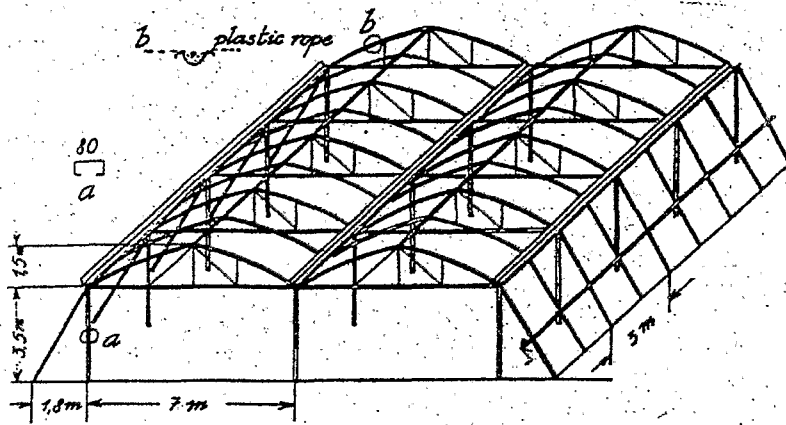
A saddle roof type greenhouse Israel (FAO book)
